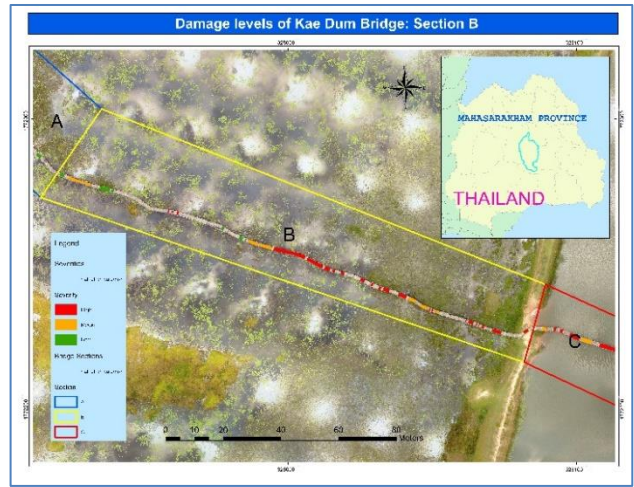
Damaged levels of Kae Dum wooden bridge: Section B
